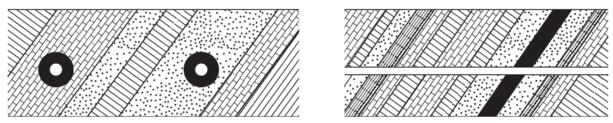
Locations of Tunnels Relative to Strike [6]
